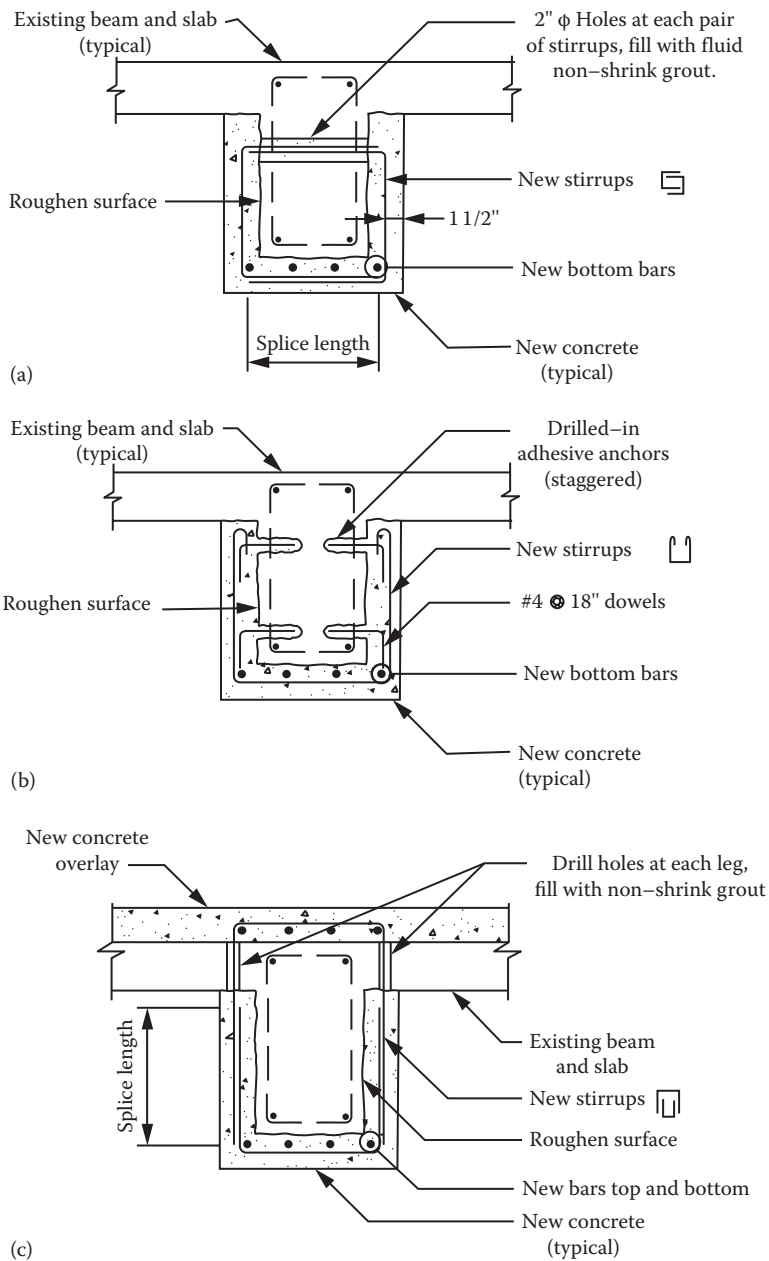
Enlarging a section of an existing concrete beam. The new and existing concrete can be tied together by (a) stirrups placed in horizontally drilled holes, (b) short dowels placed in drilled-in adhesive anchors, or (c) enveloping the existing beam.
